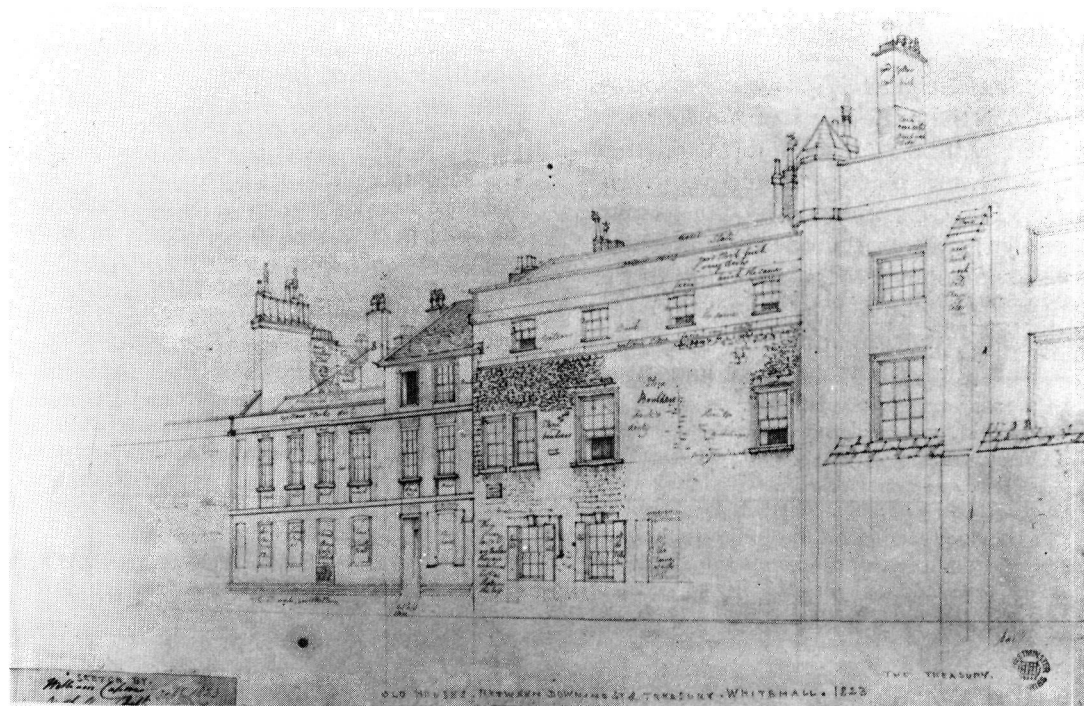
W. Capon: Drawing of 1823, of the remains of the east façade of the Great Close Tennis Play, and the building immediately south of it (Westminster City Archives)
